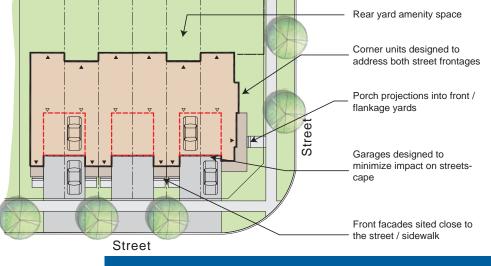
Conceptual plan layout for street townhouses
